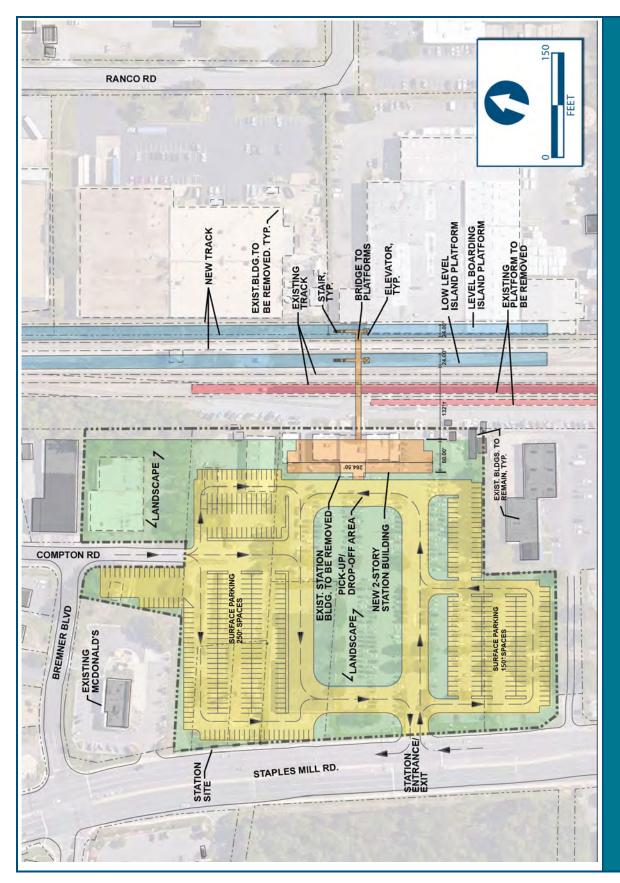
Staples Mill Road Station Improvements for Build Alternative 6F
